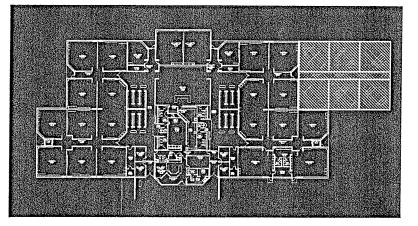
Proposed Classroom Addition approx. 6,000 GSF.
